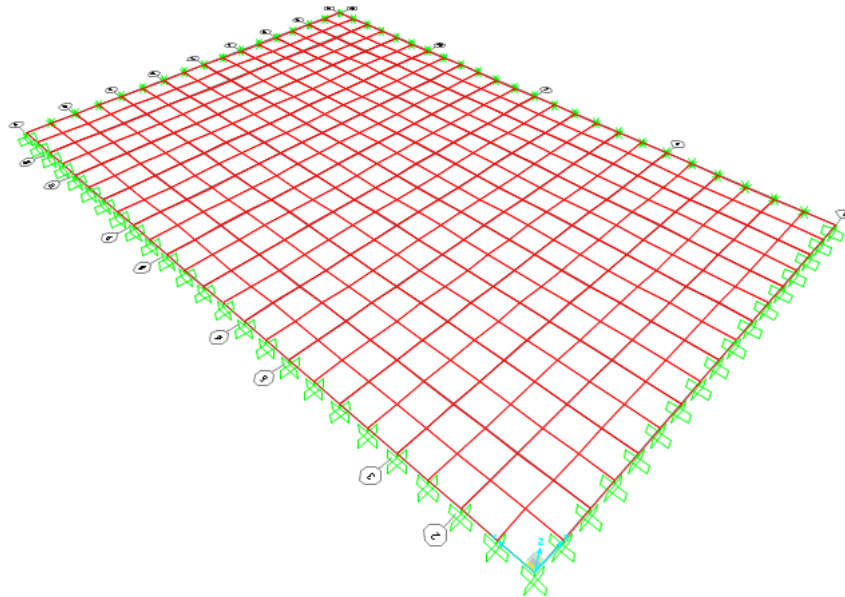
SAP2000 concrete slab model for test specimen D1
